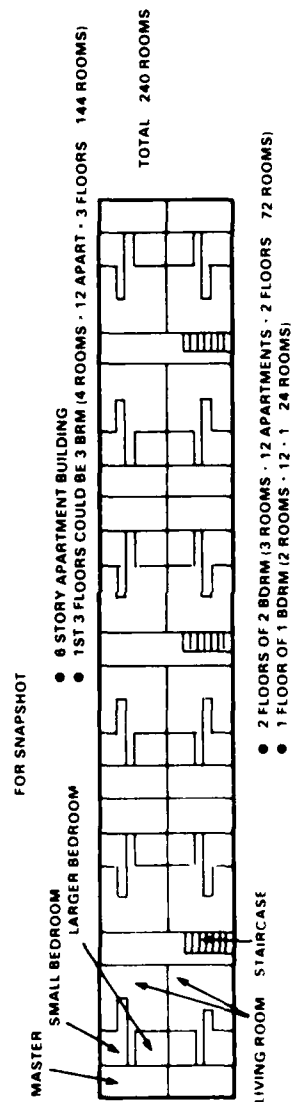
Floor Plan of Typical Suburban Apartment Building
